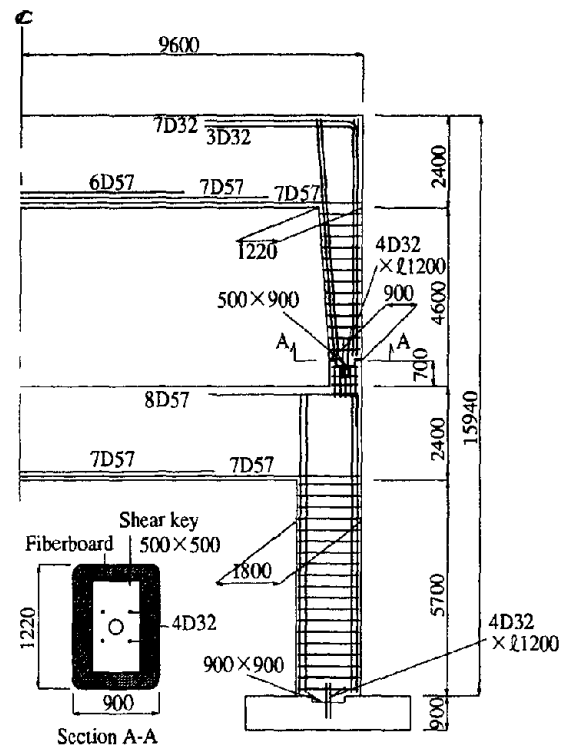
Dimension and Reinforcement Detail of B Type Bent - No.88 (Ref.12)
